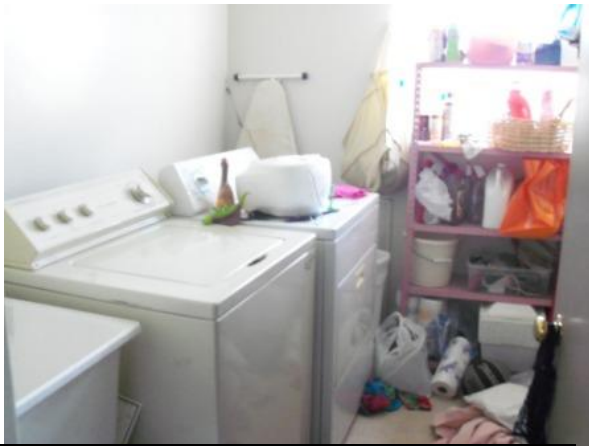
Laundry room, Unit 1032 Typical 3 Bedroom
